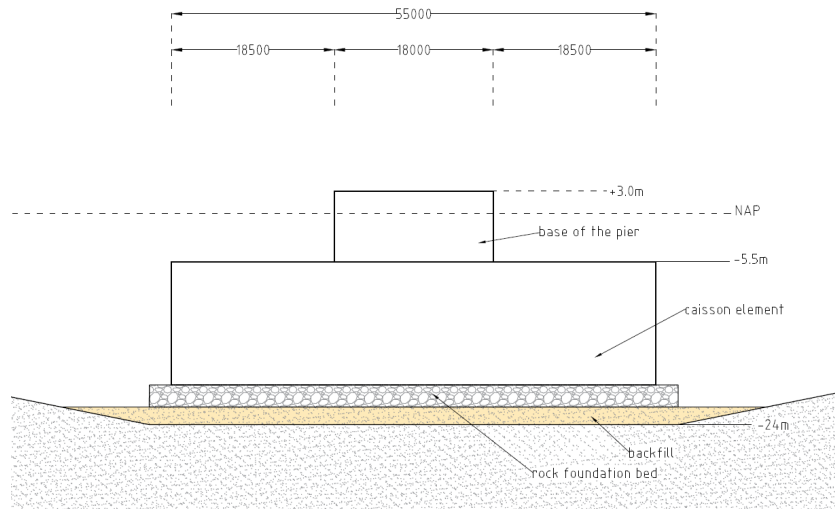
Caisson element placed on the rock bed foundation after soil improvements
